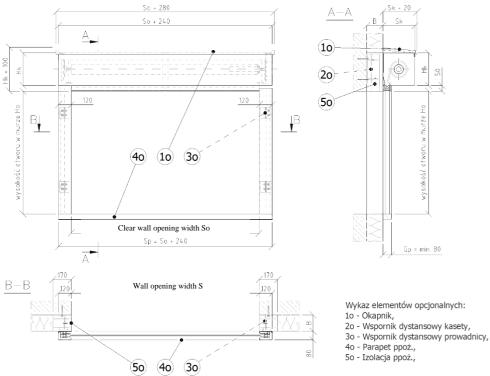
Indirect wall-mounted installation conditions for a fire safety curtain door
